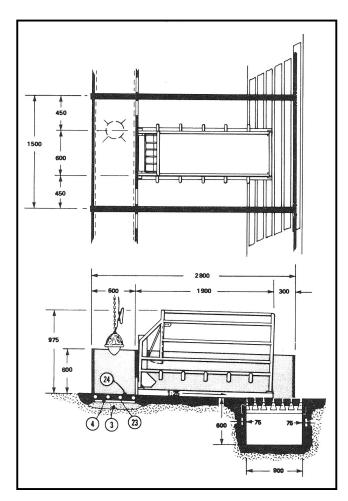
Front-creep farrowing pen with part-slotted concrete floors. Strip floor heating under the creep area is compacted sand fill 3, 38 mm extruded polystyrene insulation 4, hot water piping 23 embedded in 75 mm concrete floor 24, or use suspended radiant heating.
